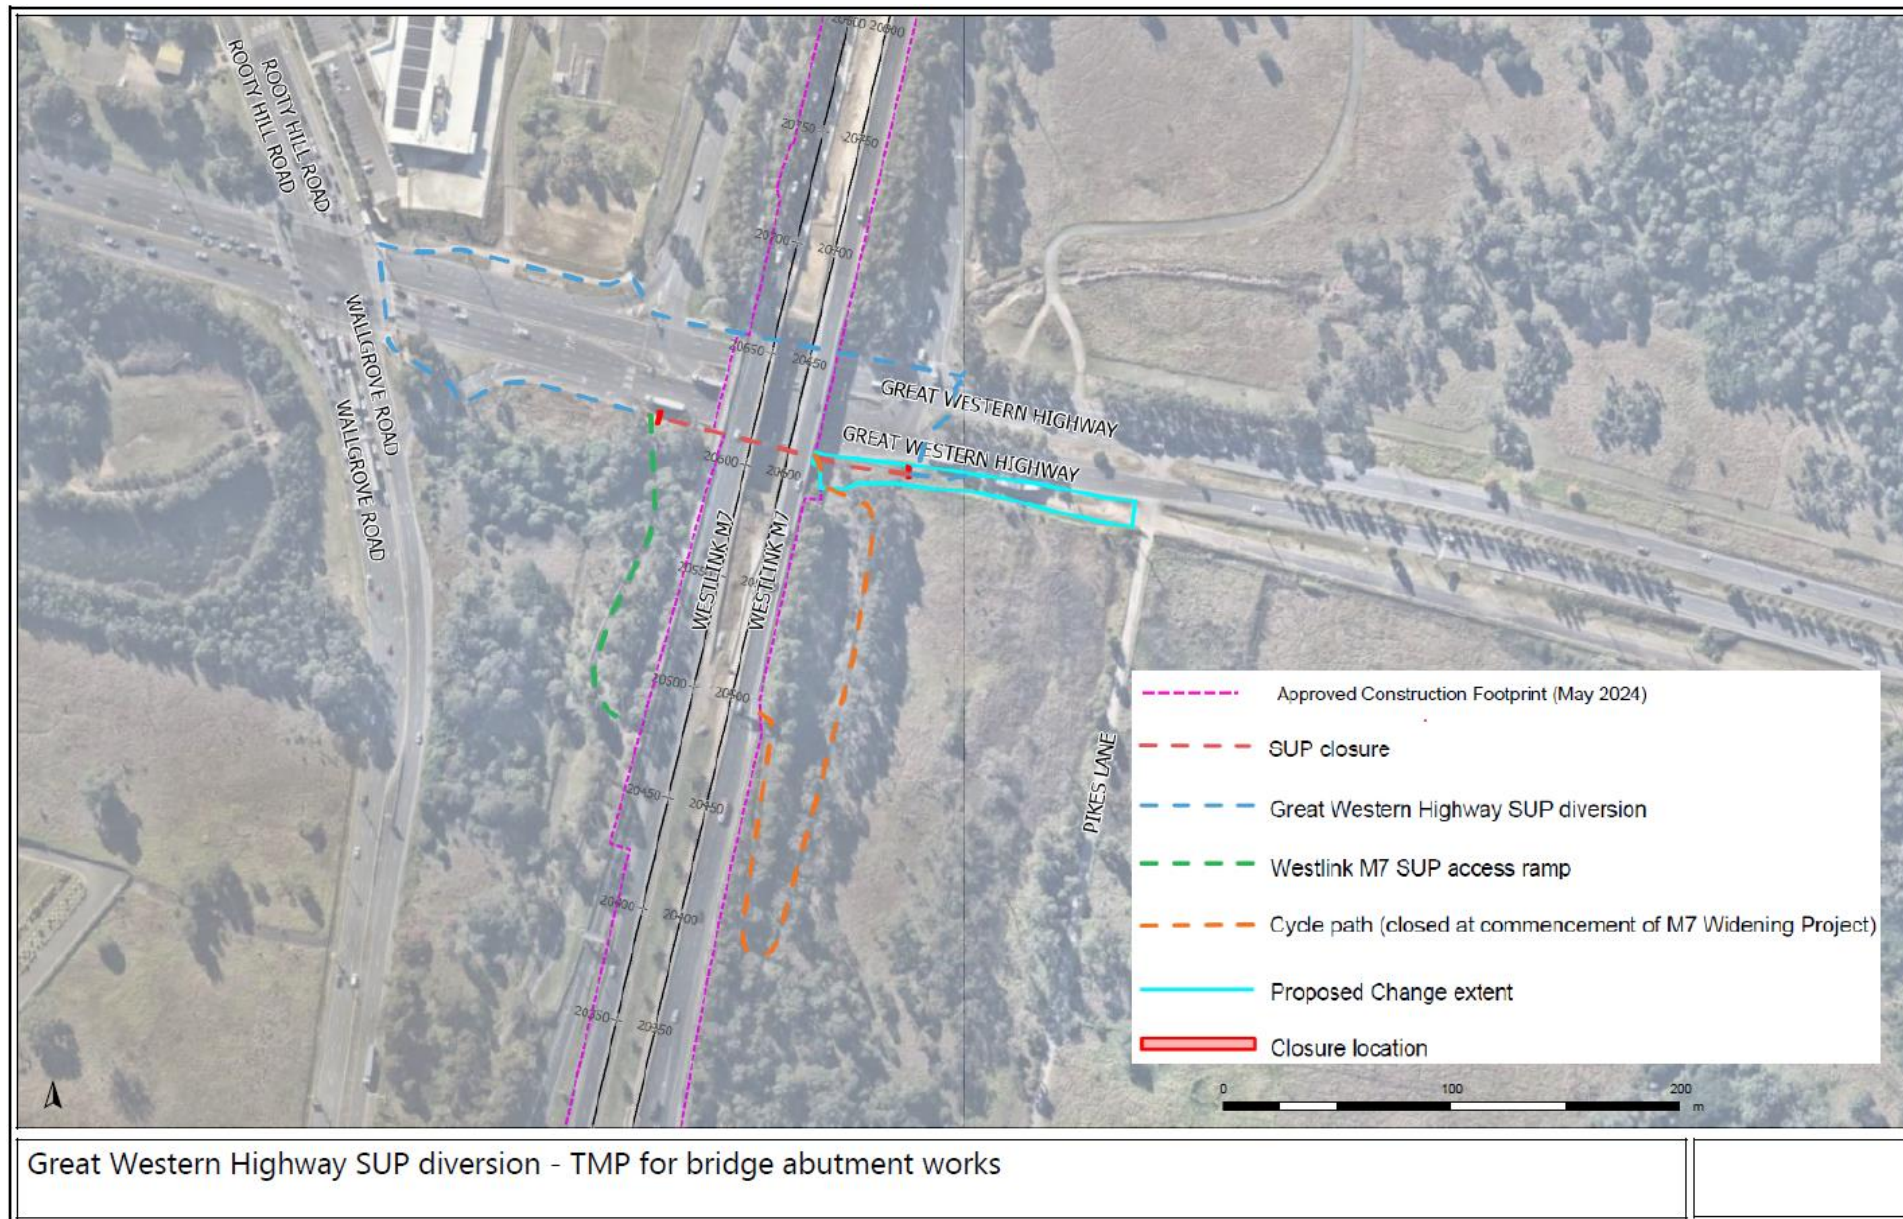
SUP diversion in existing approved Traffic Management Plan for bridge abutment works (March 2024)
